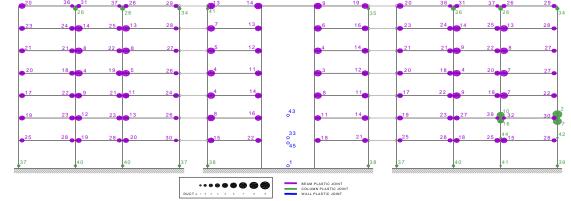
Opening of the plastic joints and required ductility, 7 stories-60x60cm columns
